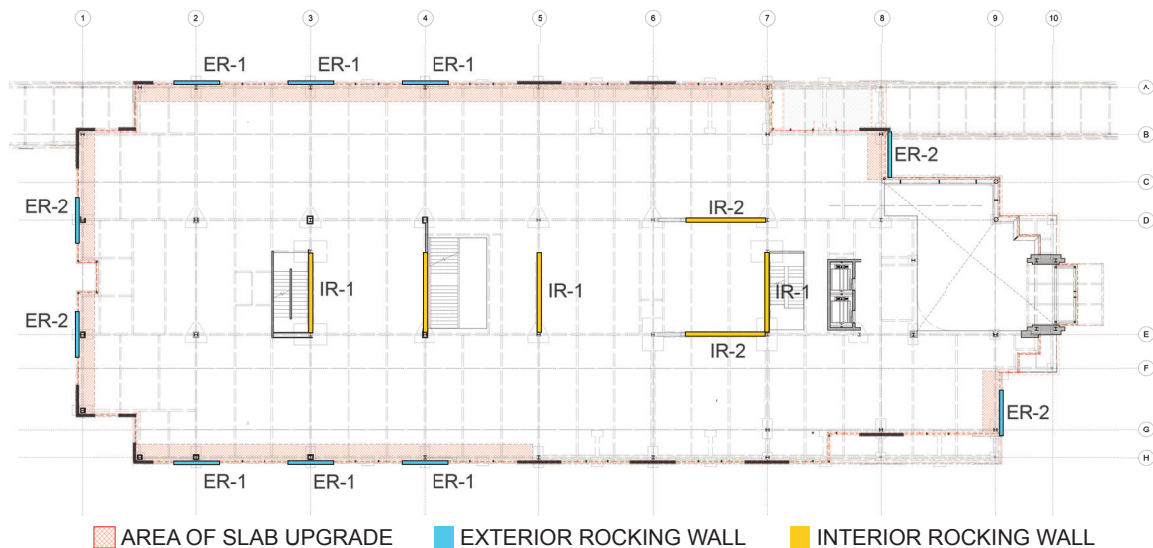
Typical floor plan depicting areas of seismic upgrade interventions
